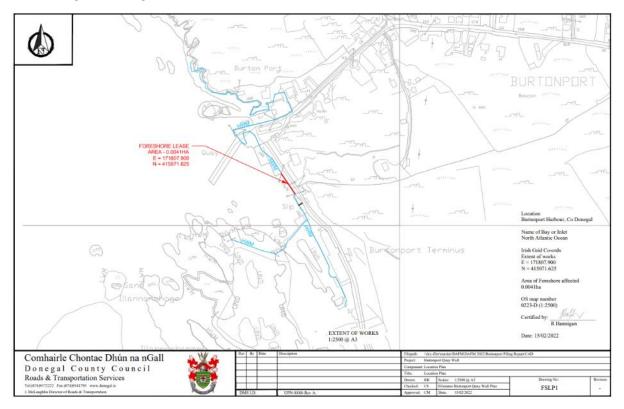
The proposed project site layout, project in red. Burtonport Quay Wall Location Plan (from applicant documents).
